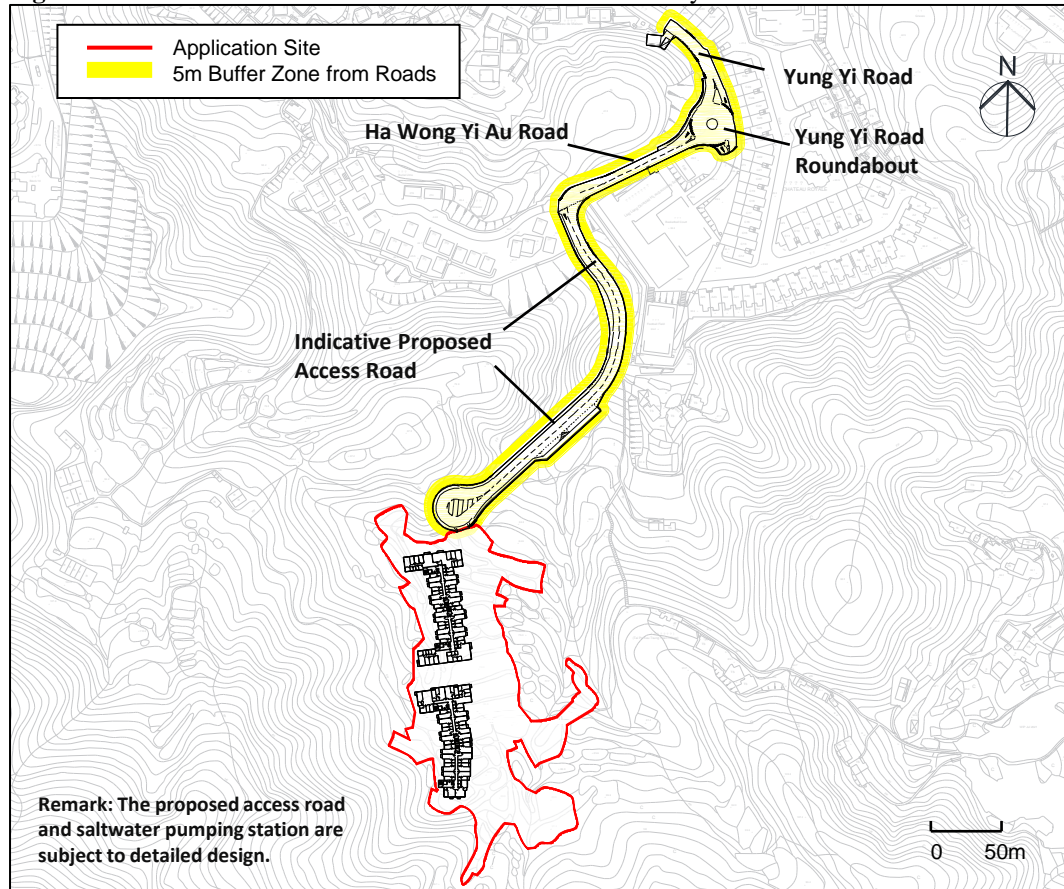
Separation distances between air sensitive uses and Yung Yi Road, Ha Wong Yi Au Road and proposed access road
